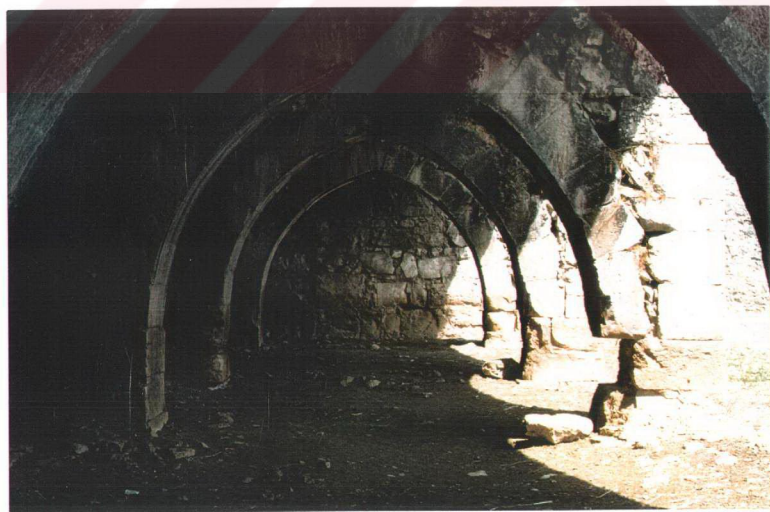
Arches and Piers that Constitute the Arcades (8/1997)
